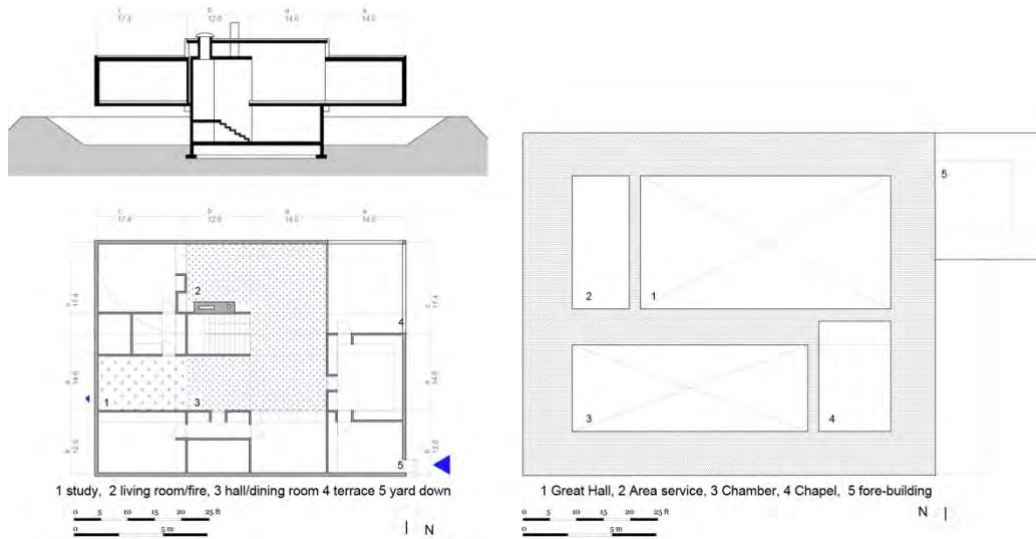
» Comparative floor plan schematics, Structuring Spaces, of Bates' Burrows and Castle Rising. (Drawing by the author).
